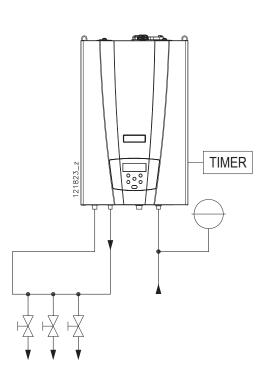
Example of system with recirculation and internal pump (see Section 5.13)
